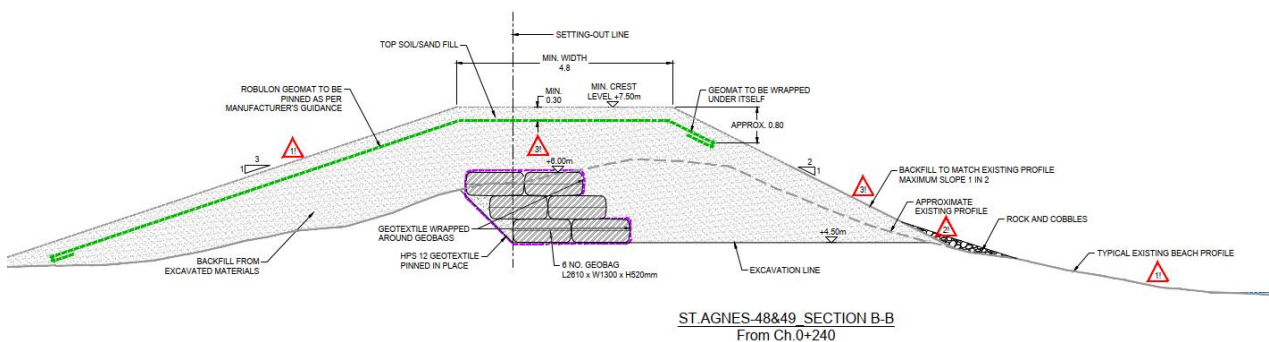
Cross-sections for revised design at Periglis (HR Wallingford, 2023)
